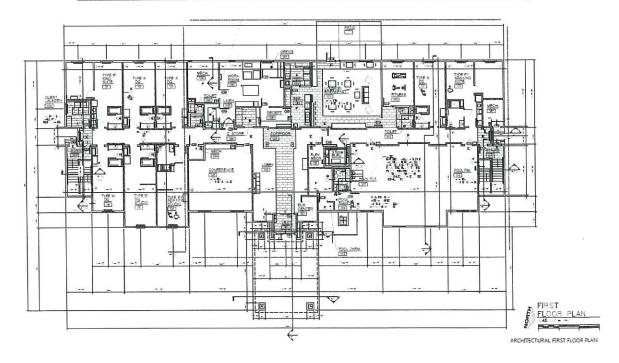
SITE PLANS AND RENDERINGS OF MINIMUM IMPROVEMENTS
